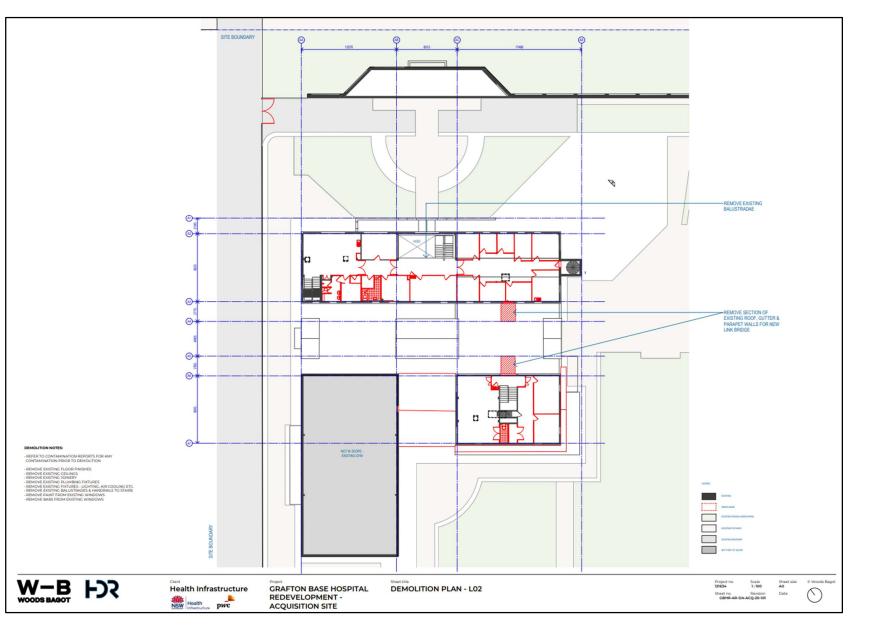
Grafton Correctional Centre Acquisition Site- Proposed demolition plan level 2
